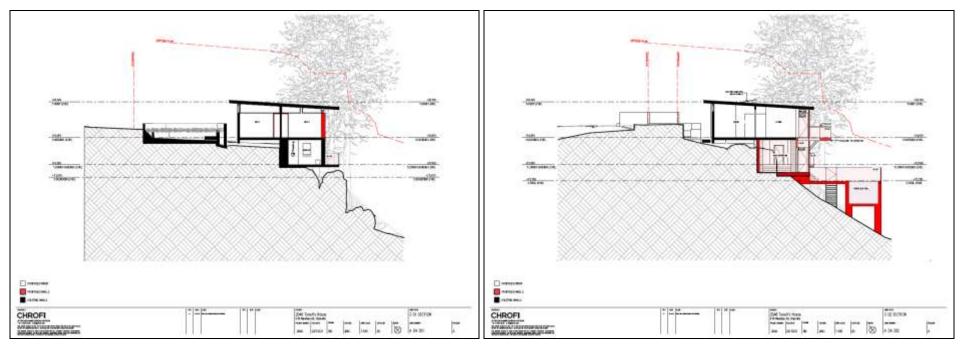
Elevations & Sections as proposed confirm minimal existing site ground level disturbance near the two (2) discussed trees.
